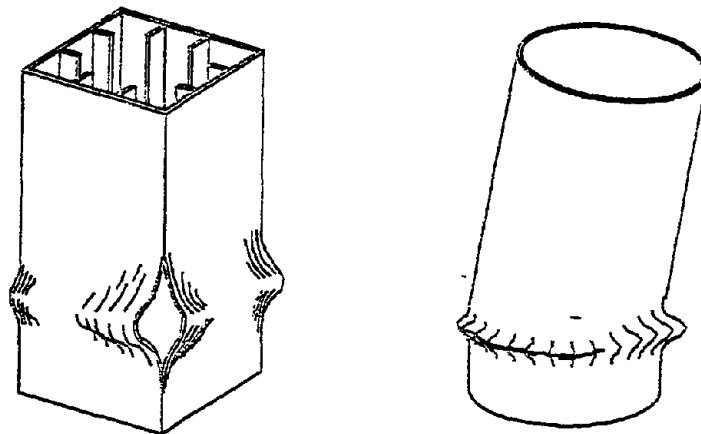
Typical Brittle Failure Modes of Steel Piers
